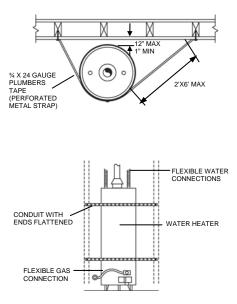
Top: Overhead View of a Water Heater Secured on a Straight Wall Bottom: Side View of a Water Heater Secured on a Straight Wall Figure 6 shows overhead and side views of a water heater secured on a straight wall.
